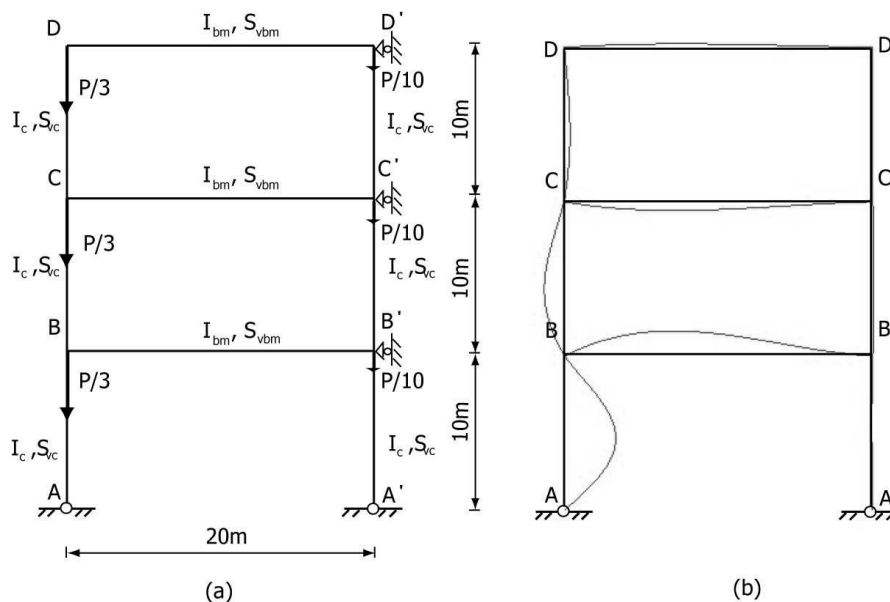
(a) Example 3: Three-story braced frame with rigid beam-column connections and non-symmetrical loading and (b) first buckling mode of frame of example 3
